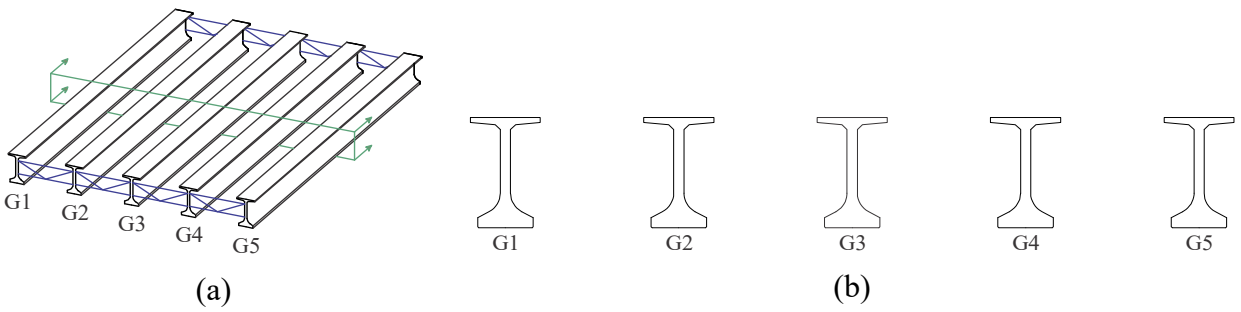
Bridge cross-section with only end-span bracing: (a) Isometric view; (b) Cross-section at the midspan
